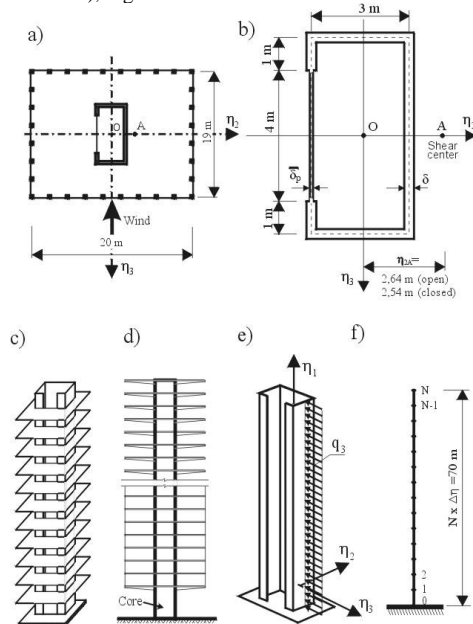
Examples of cross-section and manner of modelling of the tall building as cantilever.
